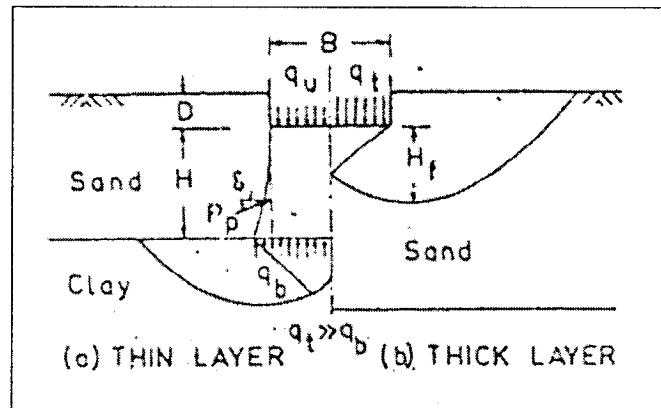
Soil failures below footing on dense sand (Meyerhof and Adams (1968))
